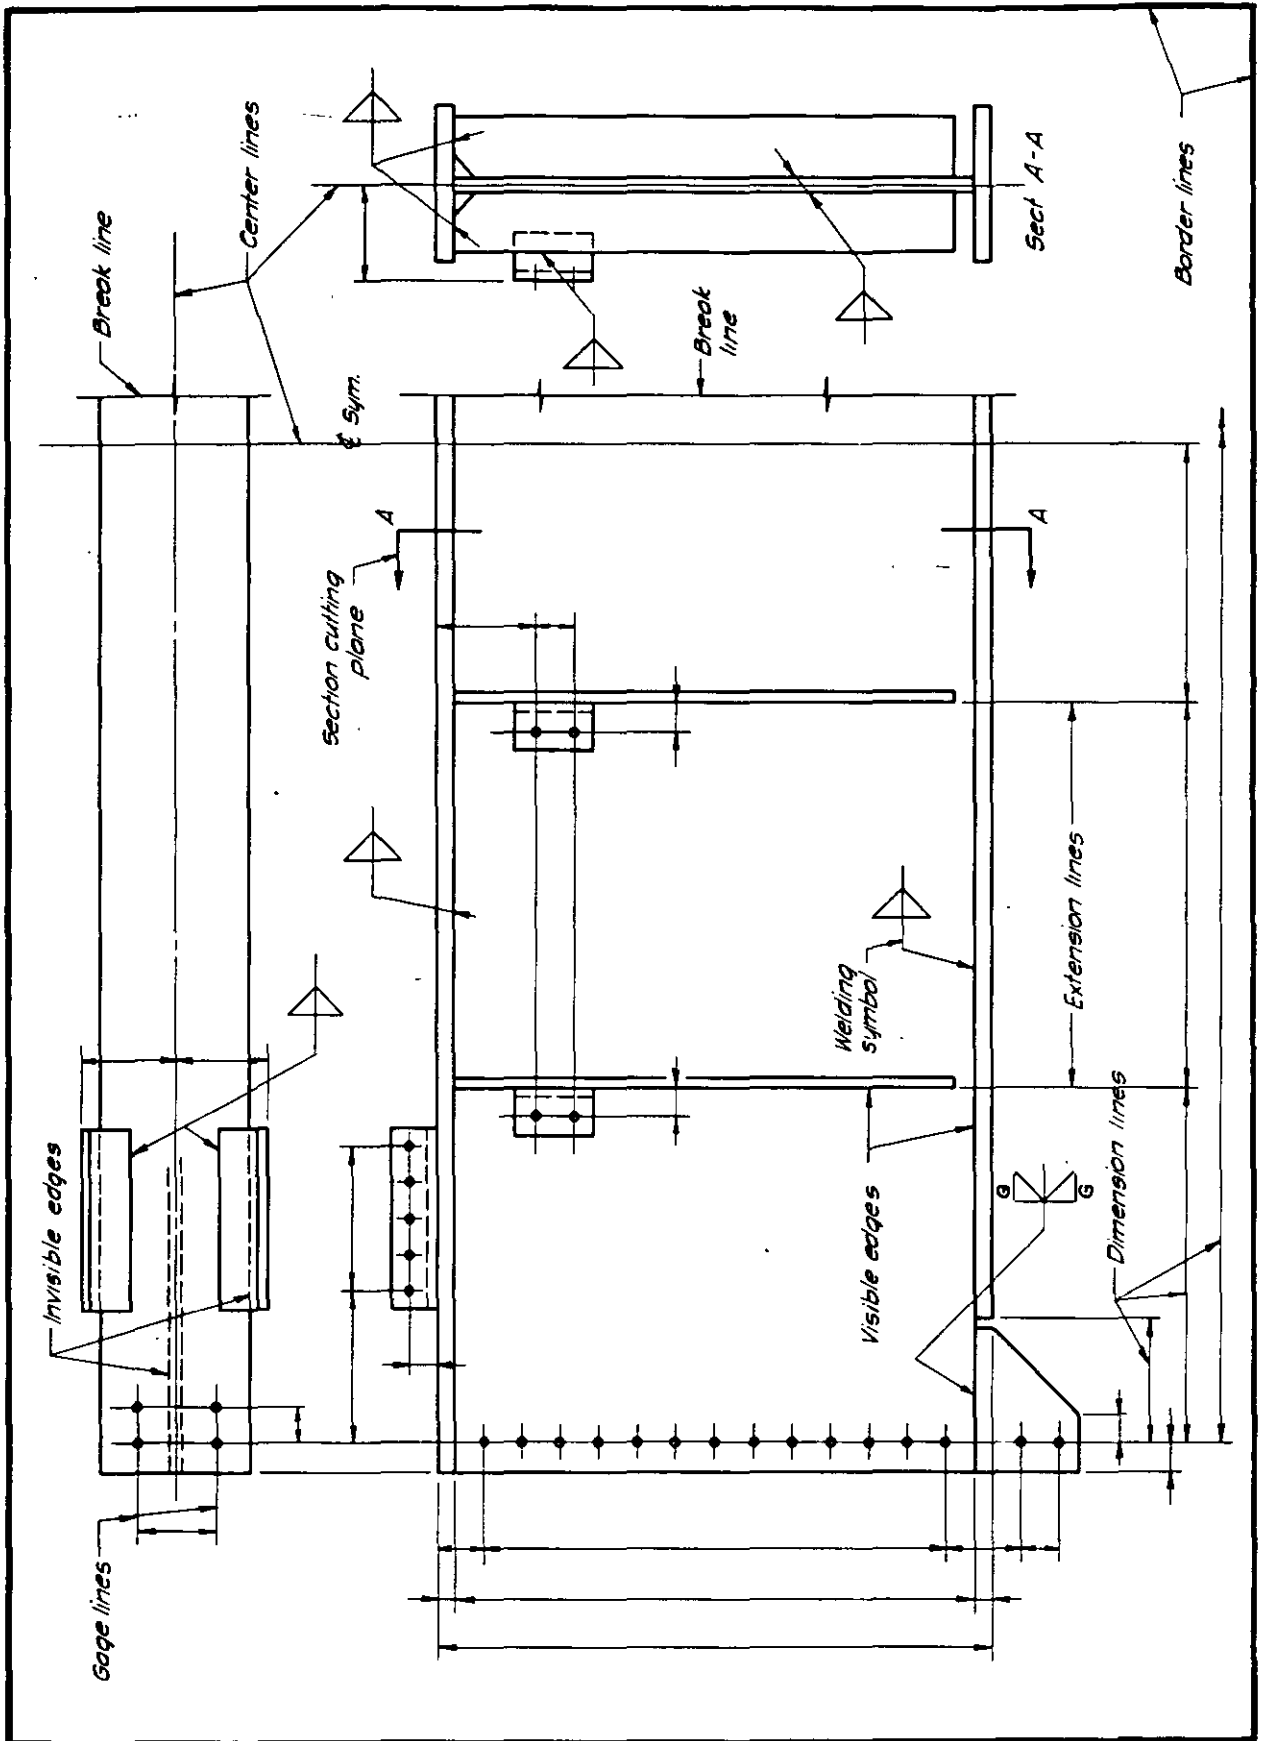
Partially dimensioned detail of girder showing conventional lines and their relative weights
